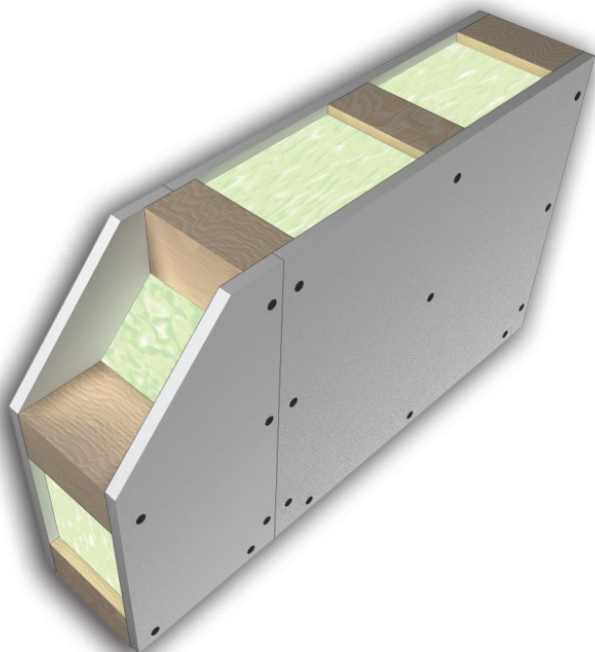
Timber Fire Wall with Single Board Each Side
